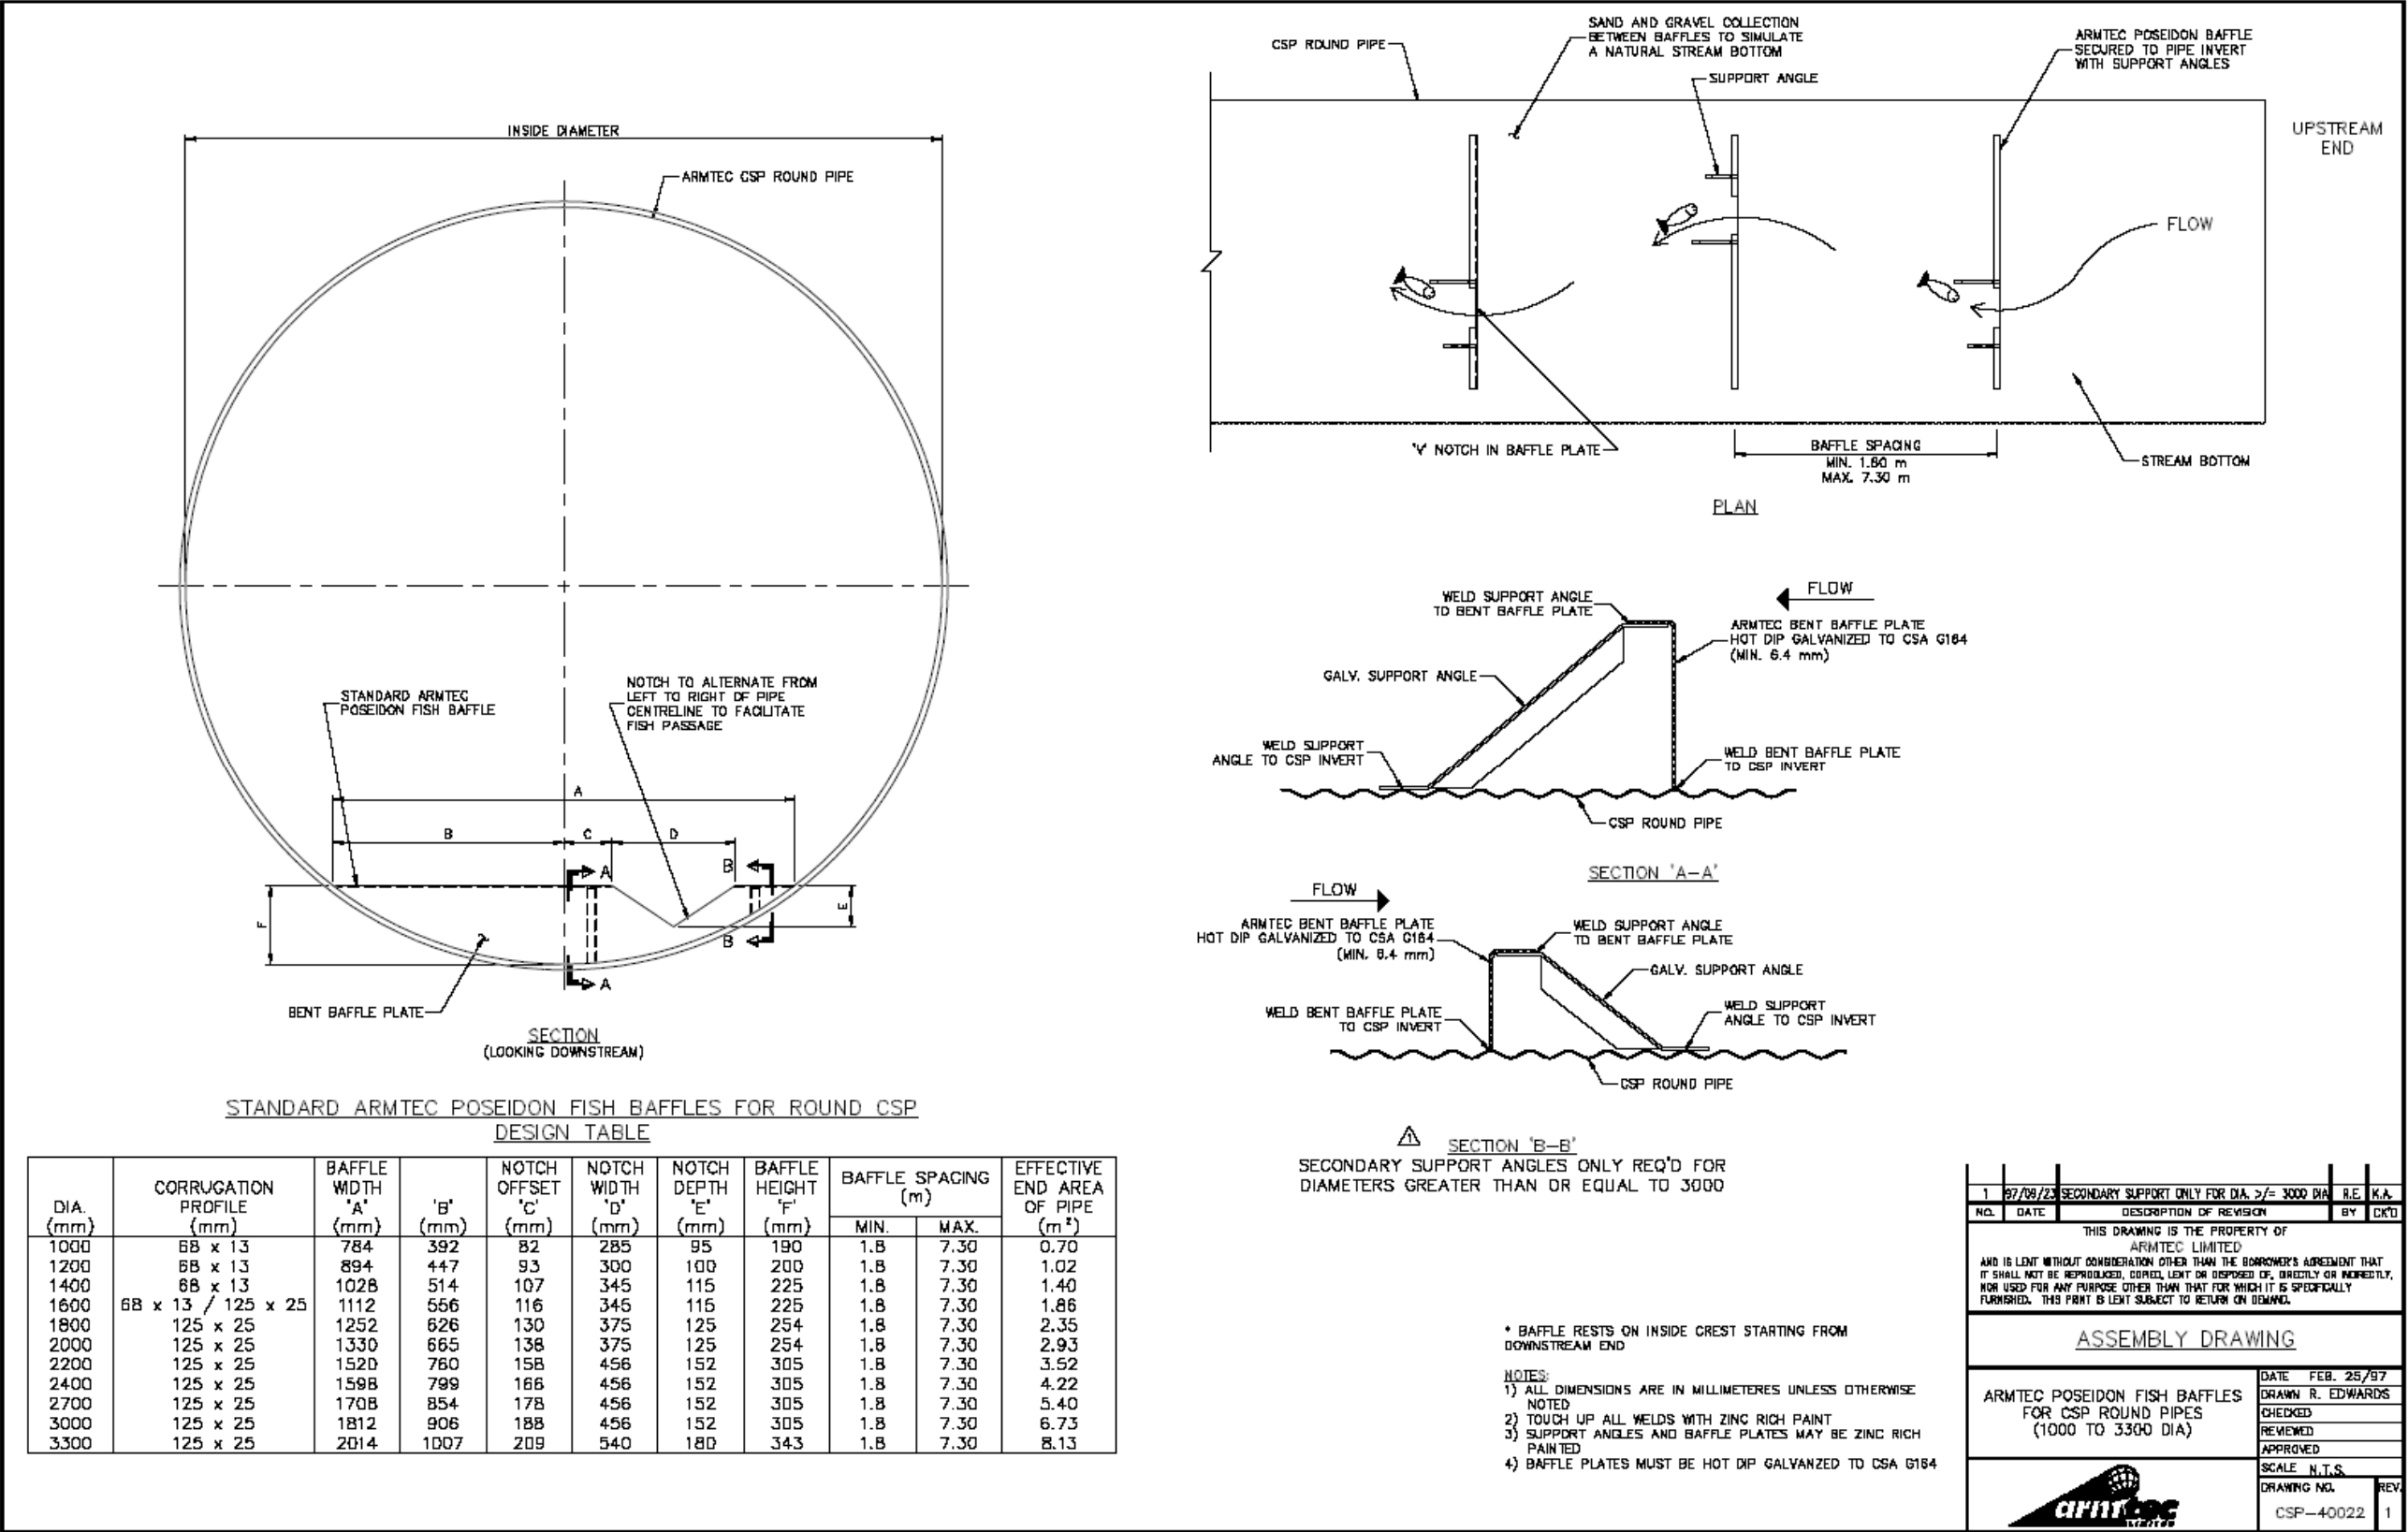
Typical design and installation drawing of fish baffles for a round corrugated culvert (Reproduced from Armtec).
